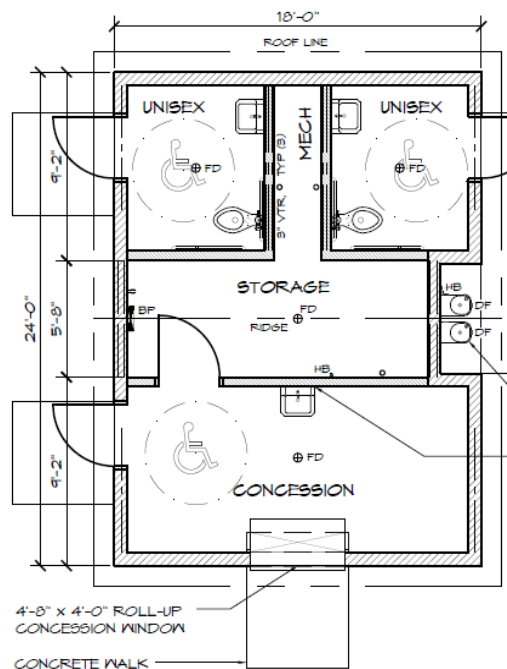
Visitor/Concession Kiosk and Restroom Building Floor Plan Example
